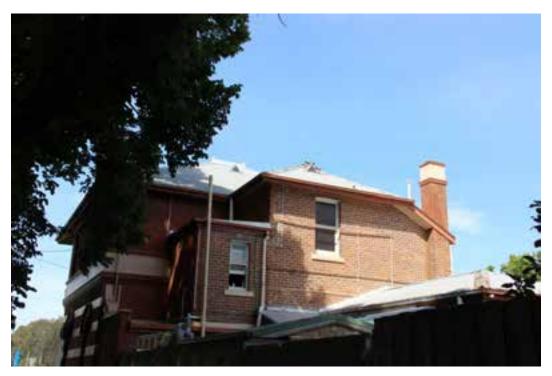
The rear elevation constructed of brown brick (not tuckpointed), and the northern roof faces with the triangular roof vents. The hipped roof of the single-storey portion of the building is evident; the tall corbelled-brick chimney is just out of frame to the right.
